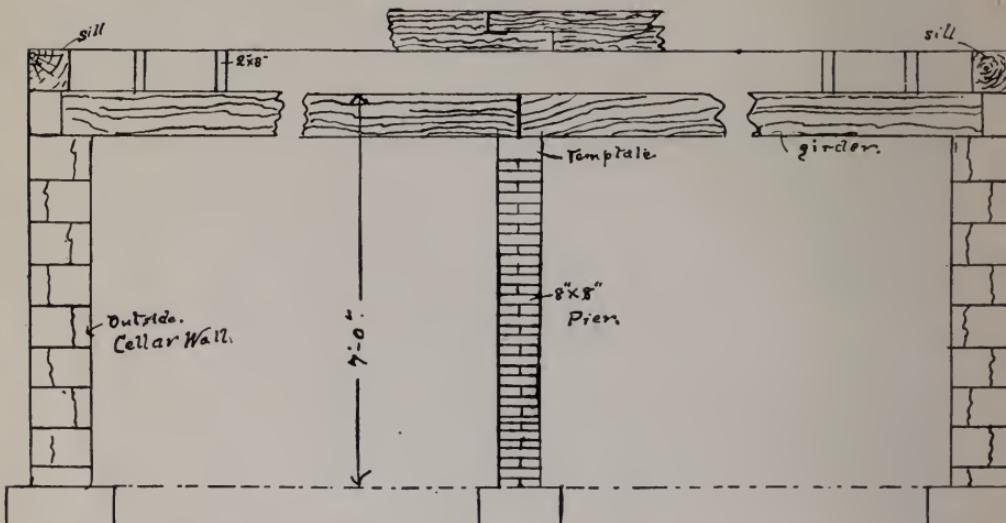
VIEW OF CELLAR WALLS, PIER GIRDER AND SILLS.
